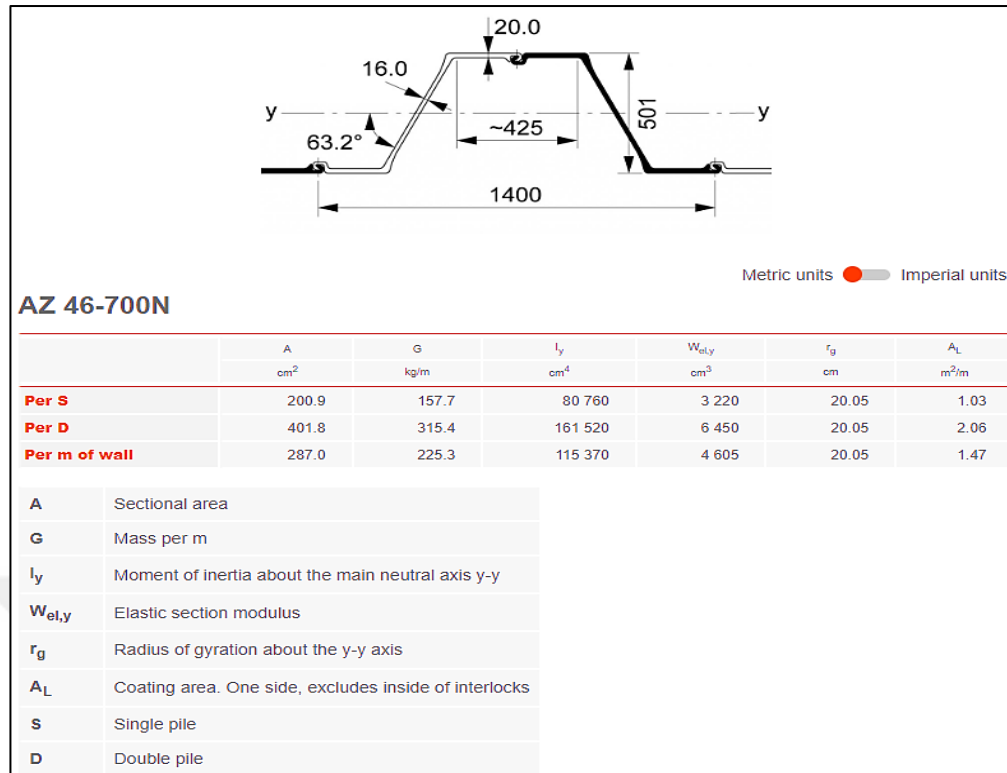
Steel Sheet Pile Section AZ46-700N. [91]
